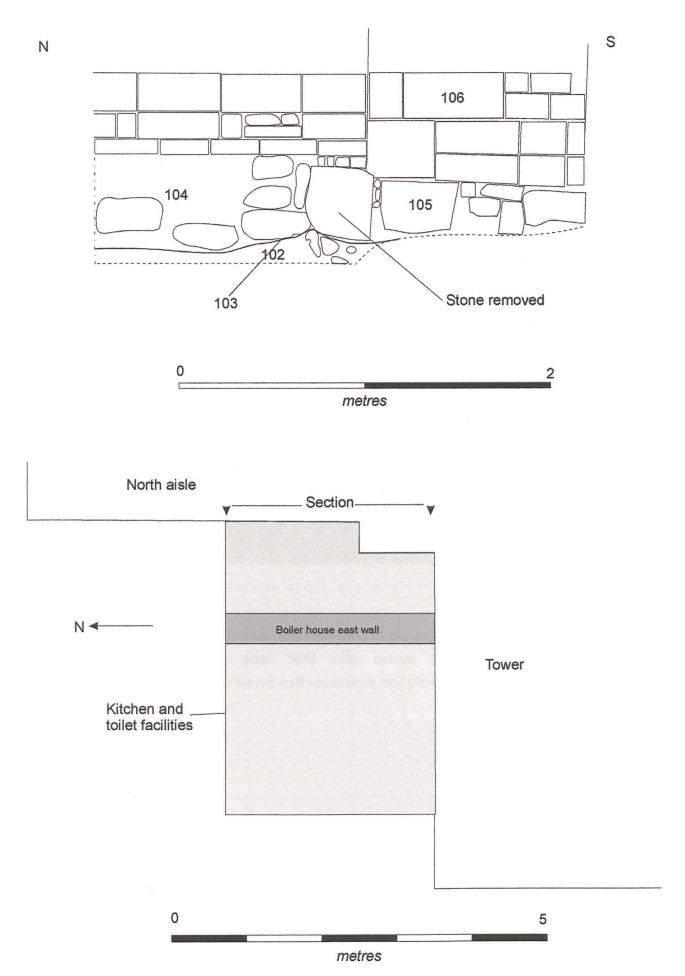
St. Peter's Church Navenby. West facing elevation and plan of footprint of new kitchen and toilet facilities.
